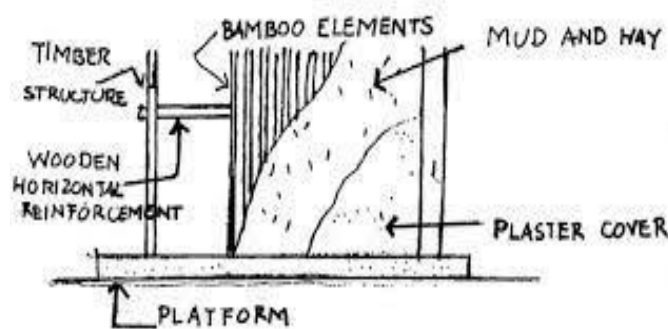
Detail of Ikra application in timber frameworks for typical Lepcha type houses.
